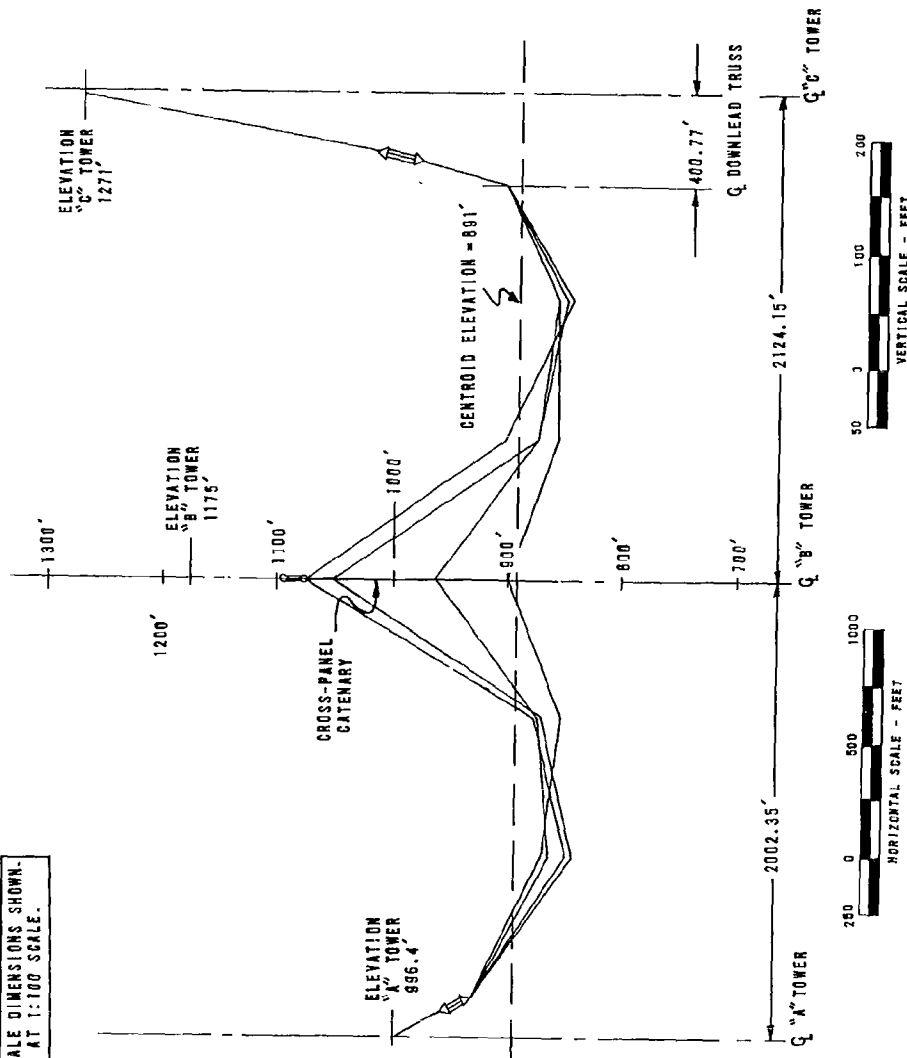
ELEVATION VIEW OF LONGITUDINAL PANEL CROSS SECTION
